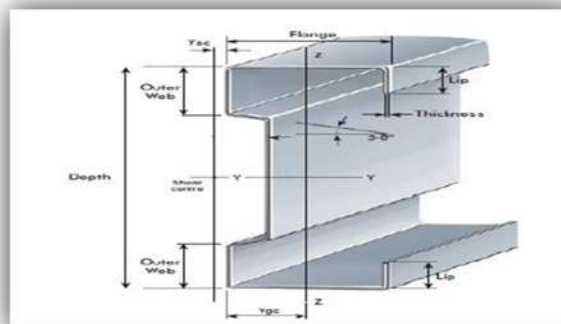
Typical view of sigma section (Anna et al., 2016)
